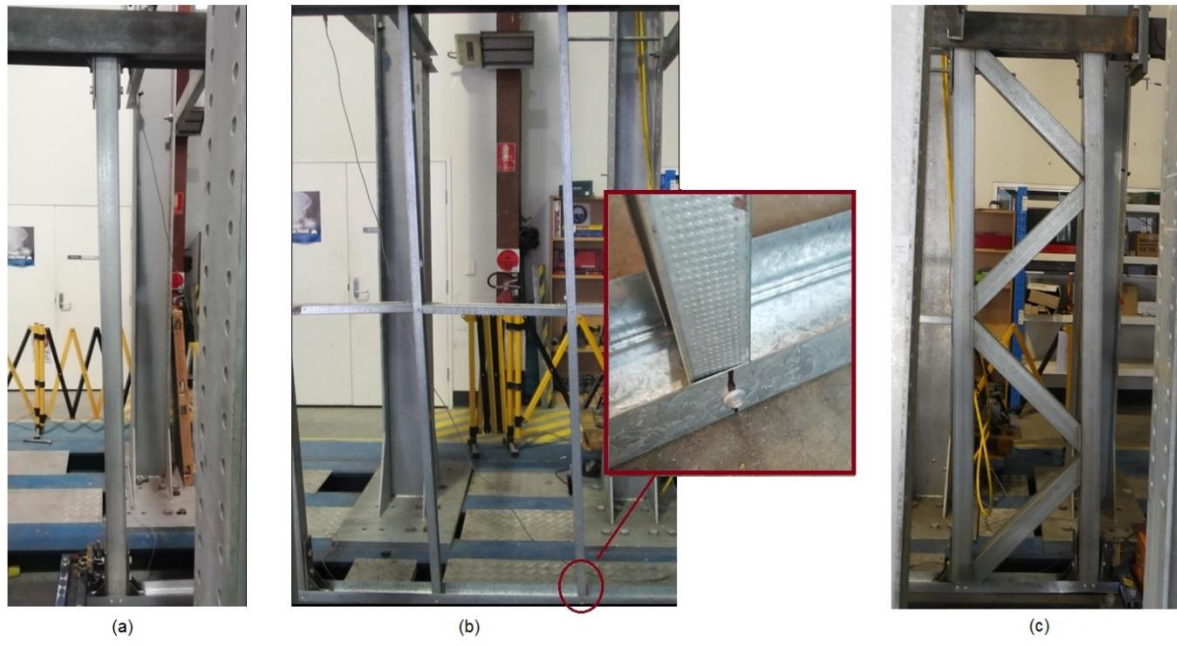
Typical deformation of a hybrid wall: a) Deformation of Single SHS element b) Deformation of CFS sections d) Deformation of SHS truss
